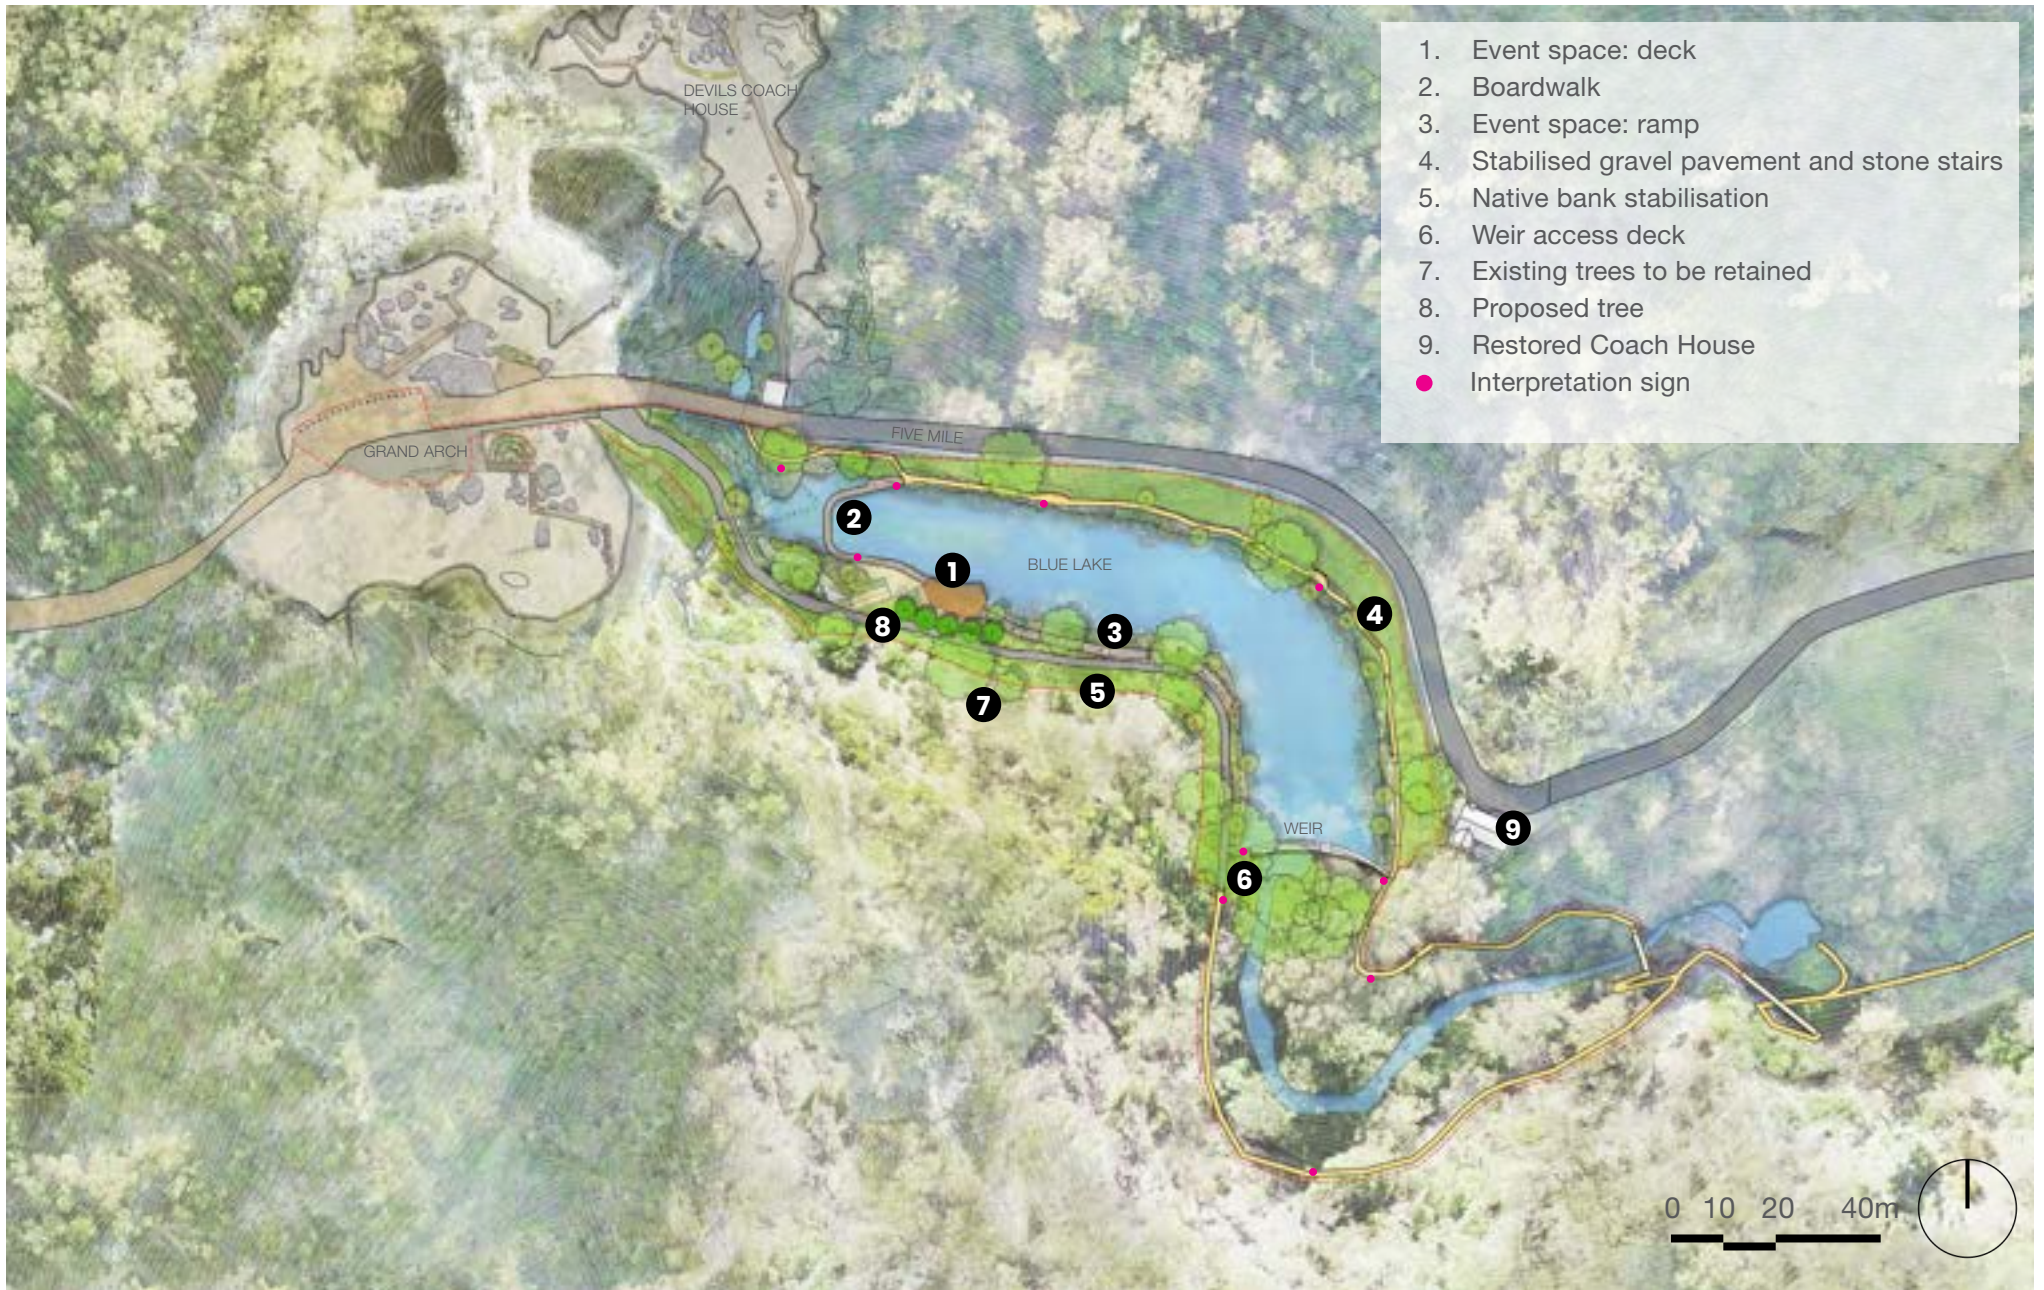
Blue Lake proposed site plan (design by NewScape)
